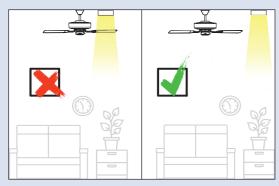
When positioning ceiling fans, it should be ensured that the fan blades do not pass through a downward-facing luminaire.
